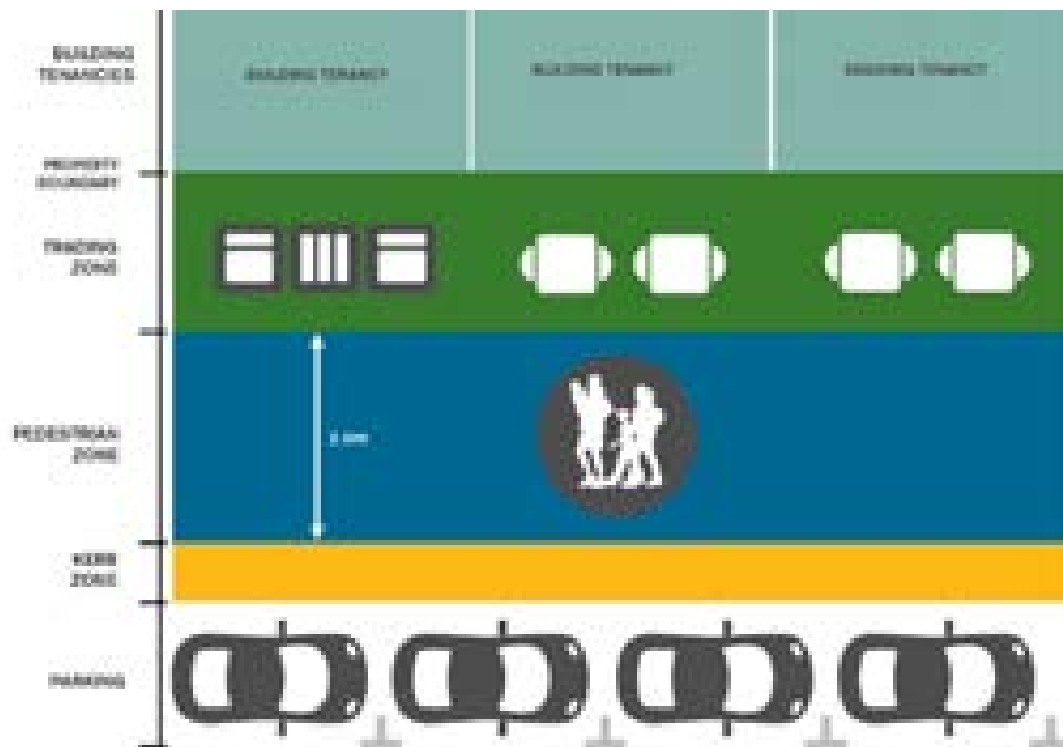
Alternative footpath zones arrangement - Trading Zone against the building and the Pedestrian Zone against the Kerb Zone
